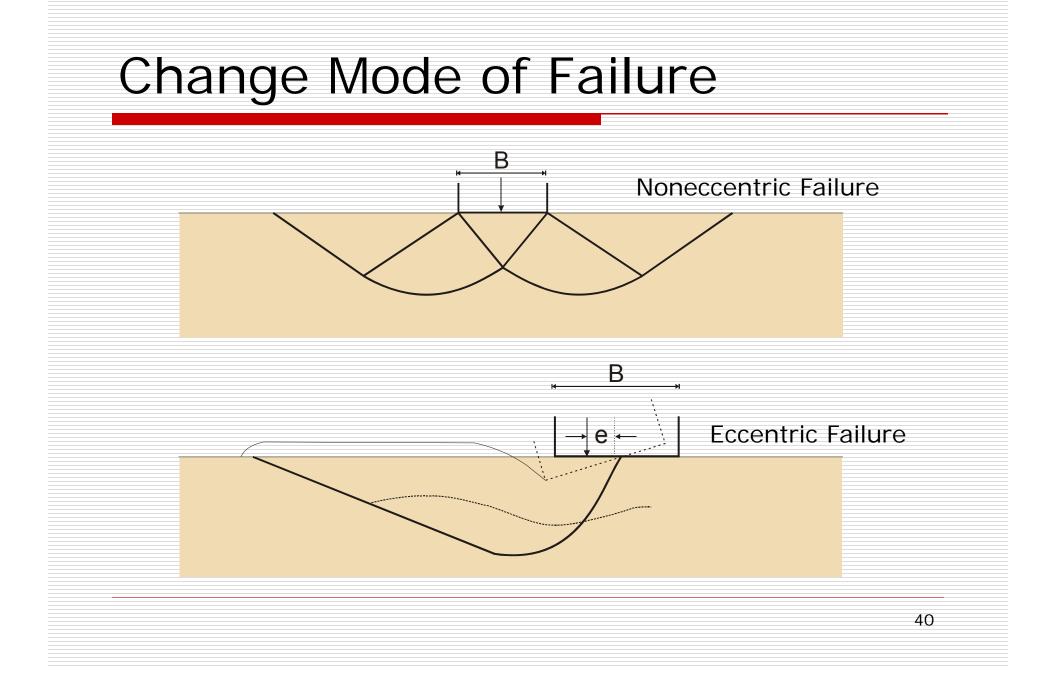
Nature of failure surface in soil supporting a strip foundation subjected to eccentric loading (*Note:* $D_f = 0$; Q_{ult} is ultimate load per unit length of foundation)
